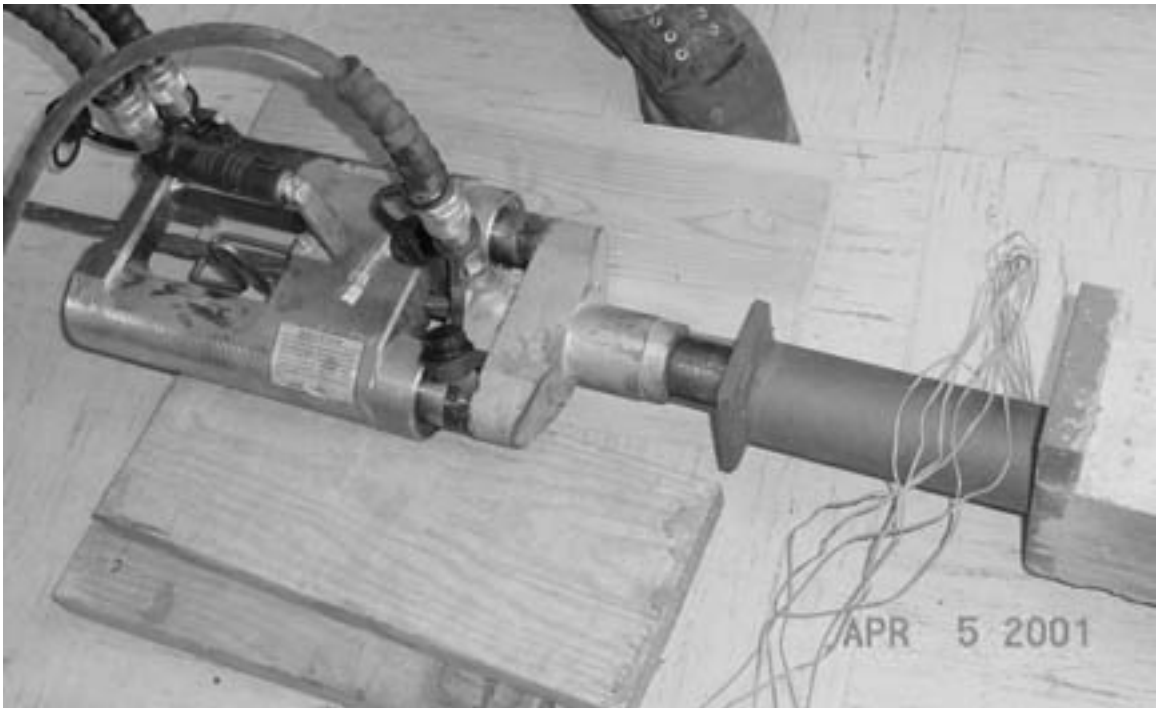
Prestressing Jack on Solid Beam with Strain Gage Block
